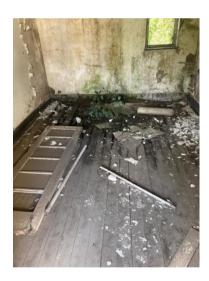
Showing severe moisture damage to suspended timber floors.
